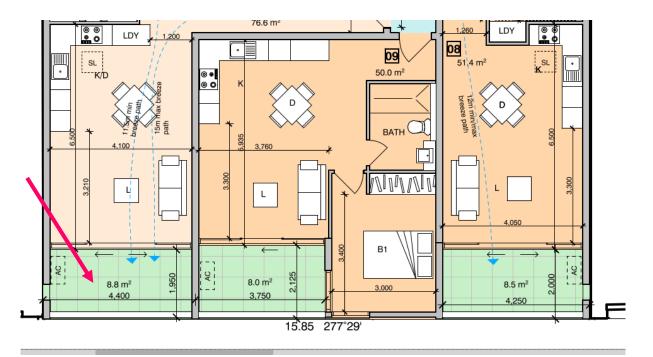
Example of the balcony sizes to apartments 8, 9 and 10 facing Broadway on the second floor.
